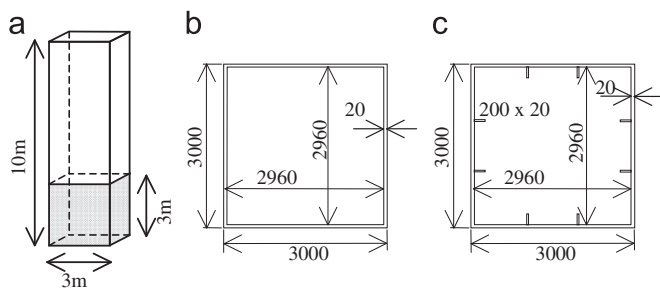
Typical numerical model. (a) Column outline, (b) column section without stiffener and (c) column section with stiffeners.
